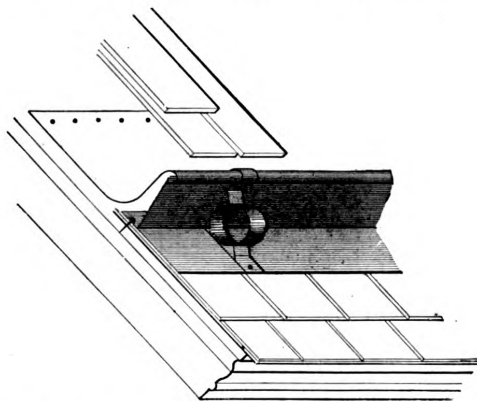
Section through Roof, Illustrating the Use of the Gutter and Support Shown in Previous Figures.
